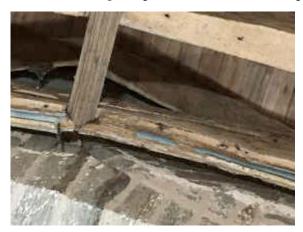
\sim losses$ to the timber structure in general and to the wall plate line (above right) were observed throughout the church.
